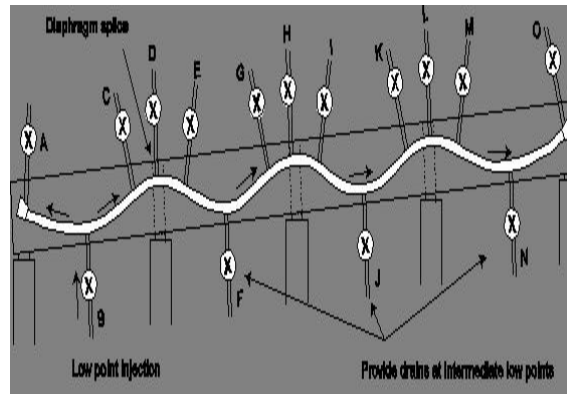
Grouting details for a 4-span spliced girder duct system
